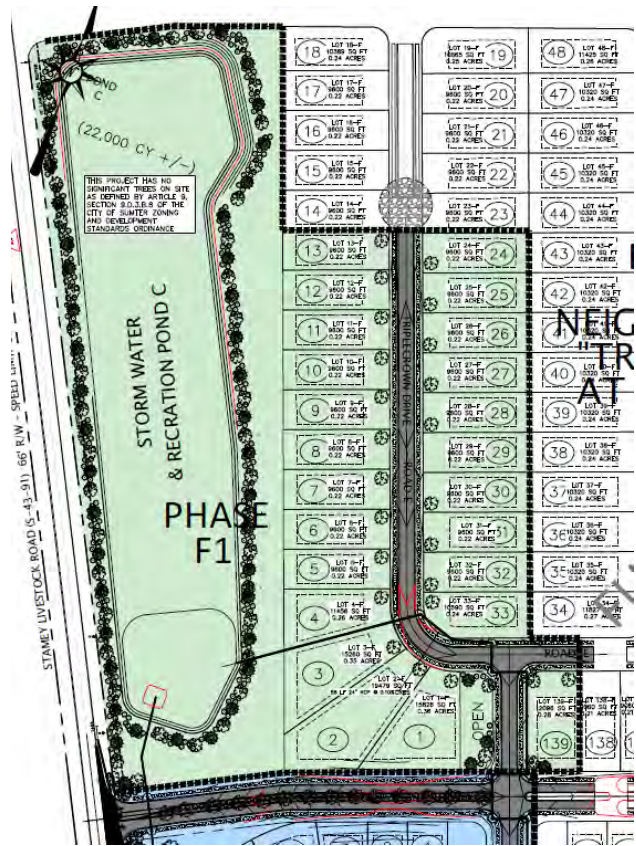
Triplecrown at The Village, Phase 1 Landscaping Plan and Planting Schedule
